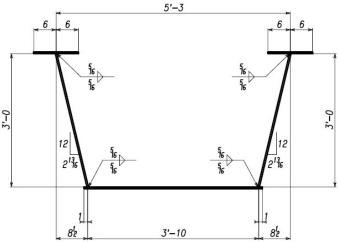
Full-Scale Baseline Tub Girder Specimen - Cross Section
